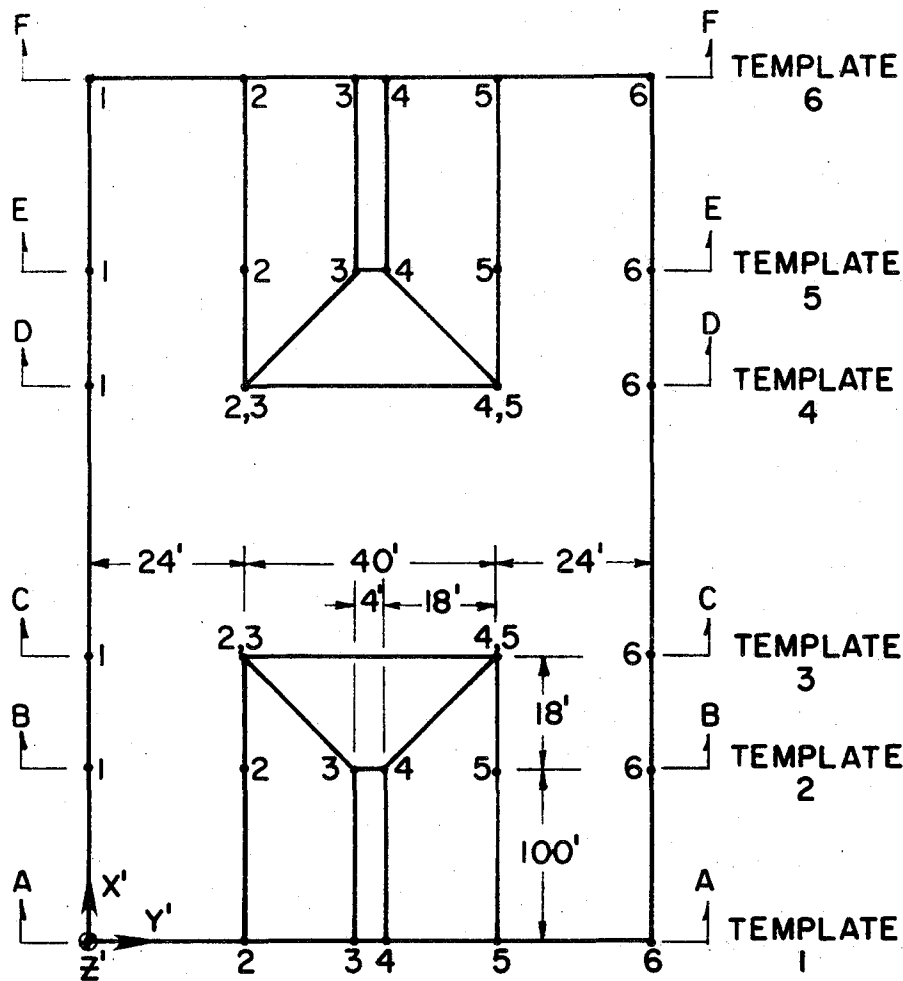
MEDIAN CROSSOVER AND ADJACENT DITCH SECTIONS (PLAN VIEW)
